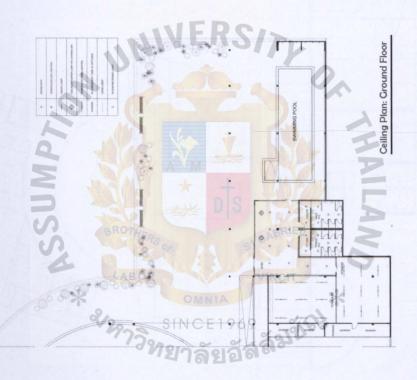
REFLECTED CEILING PLAN: GROUND FLOOR
